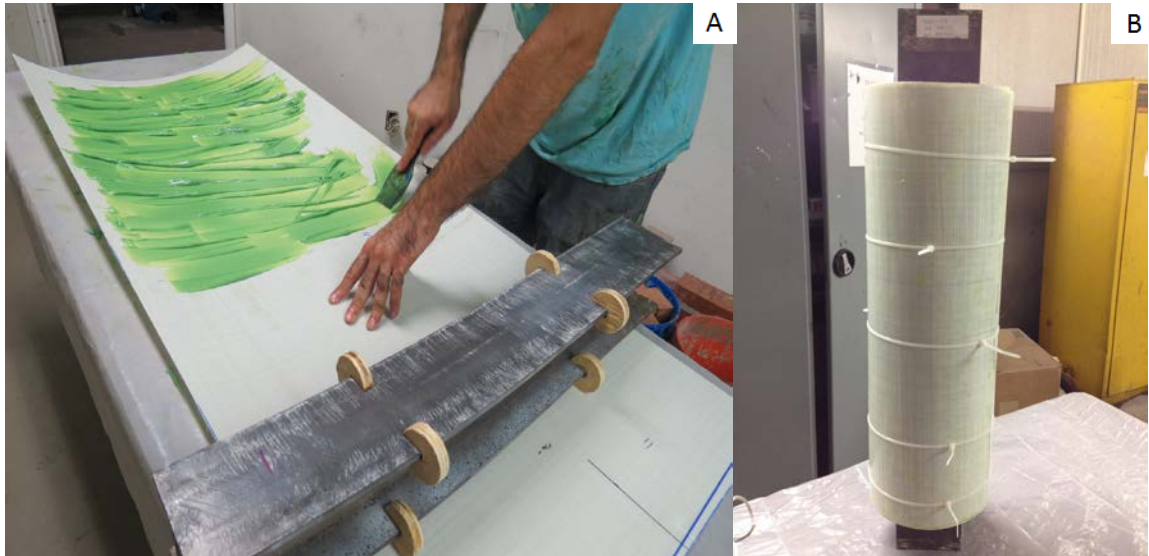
A) Application of Epoxy to GFRP laminates; B) Wrapped Steel Pile
